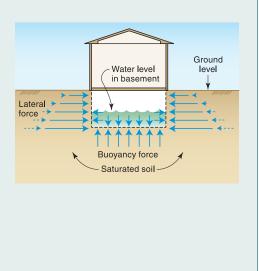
A home with a wet floodproofed subgrade basement. Note: Wet floodproofing a basement is not permitted to achieve NFIP compliance. If Substantial Improvement or Substantial Damage requirements are triggered, the basement would need to be filled.
